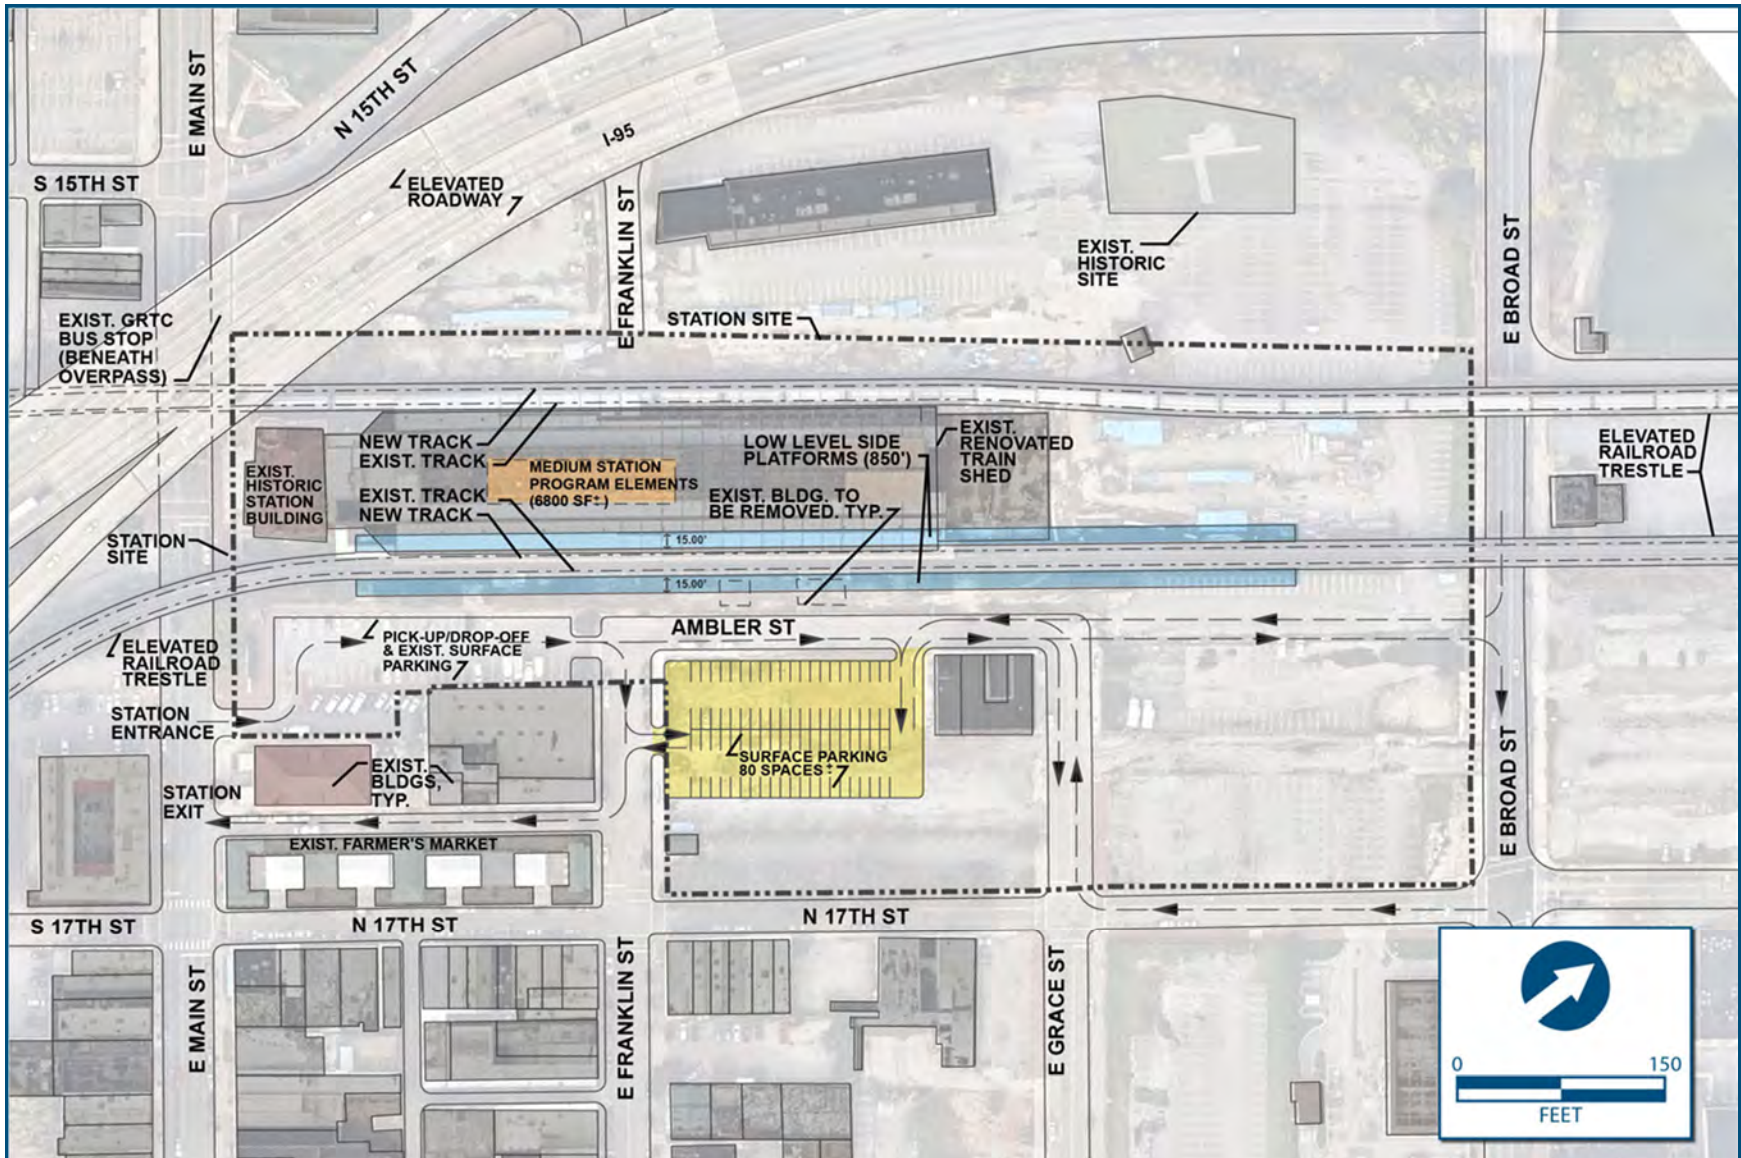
Main Street Station Improvements for Build Alternative 6E
